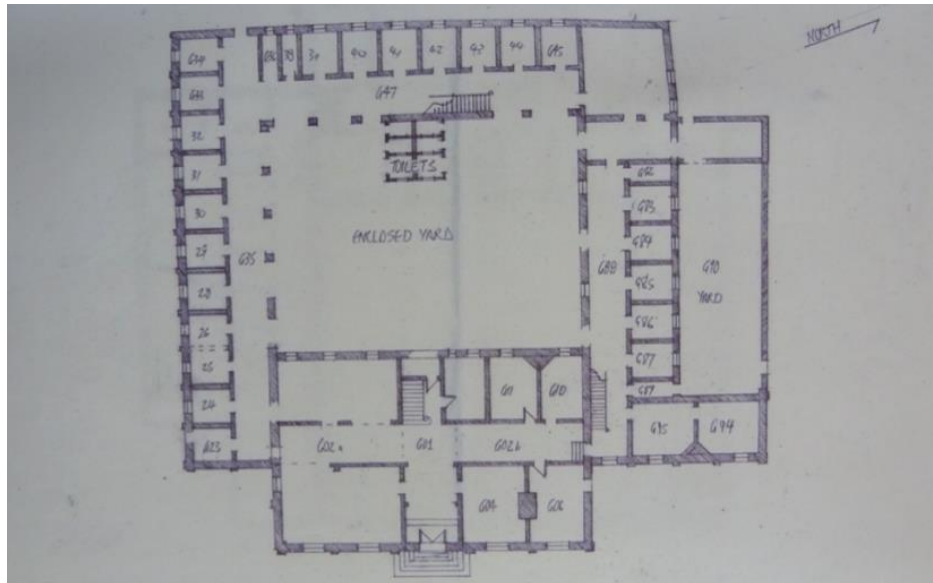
Dunedin Prison presumed original construction features, Ground Floor, with spaces numbered as on Opus 2007 plans. A post 1915 ground floor drainage plan of the building suggests that the east-west wall dividing the toilets in the courtyard extended across the yard, dividing it in two. (Source: Guy Williams and Associates / NZHPT, December 2009)
